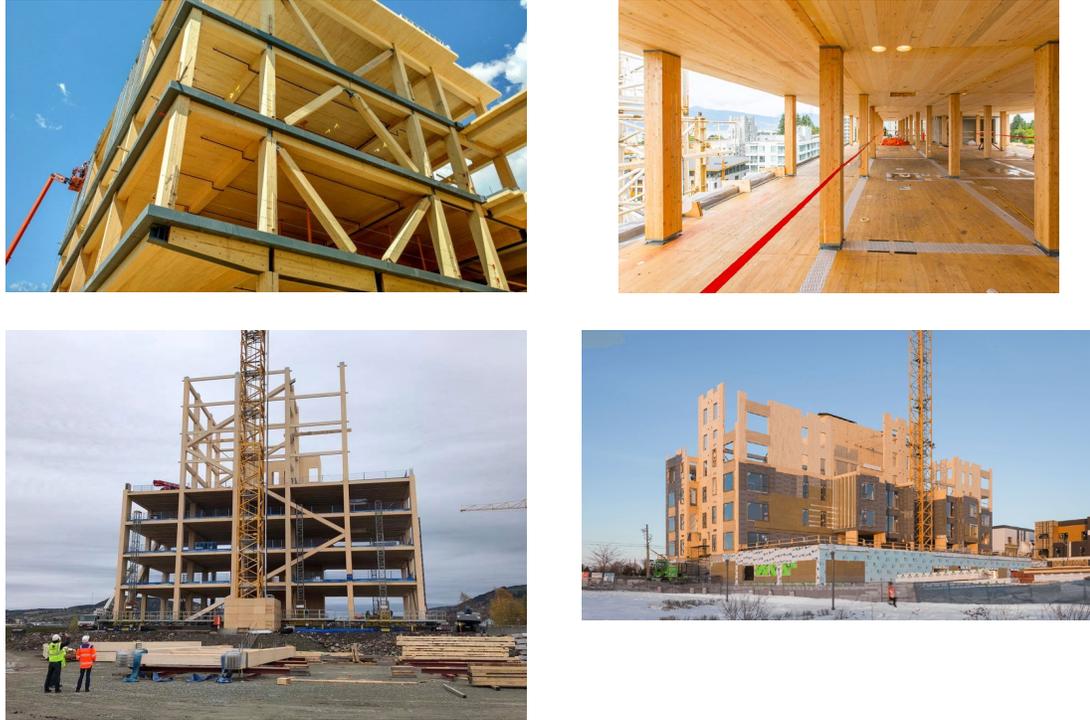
(Left to right) UMass Design Building, Brock Commons, Mjøstårnet, and Origine all in construction.
